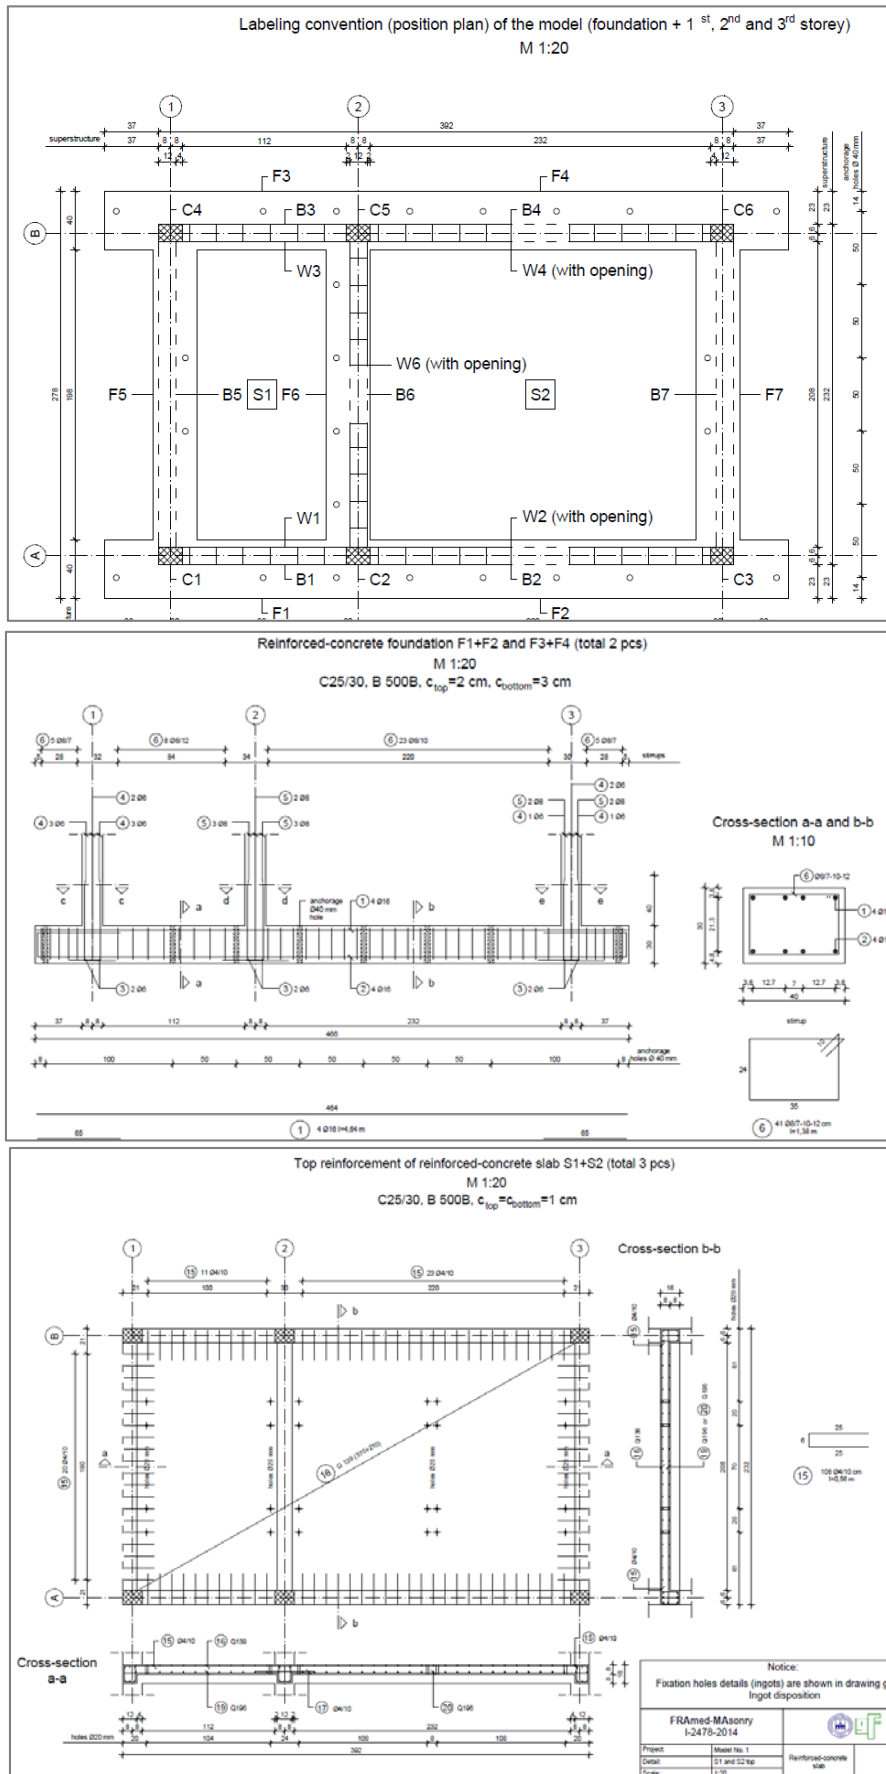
Formwork and reinforcement details – Model IW-SB
